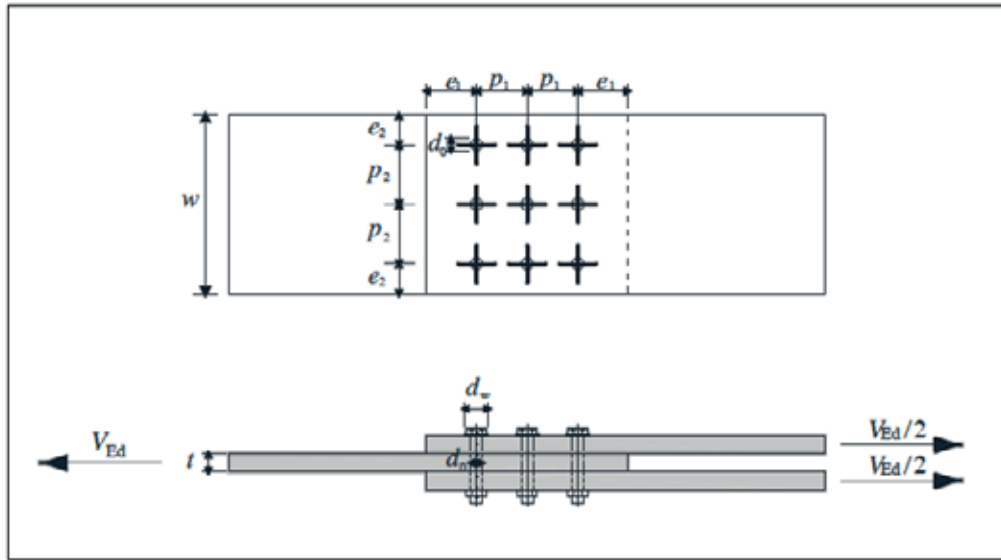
Bolted lap shear joint with symbols for fasteners; not for staggered bolting.
